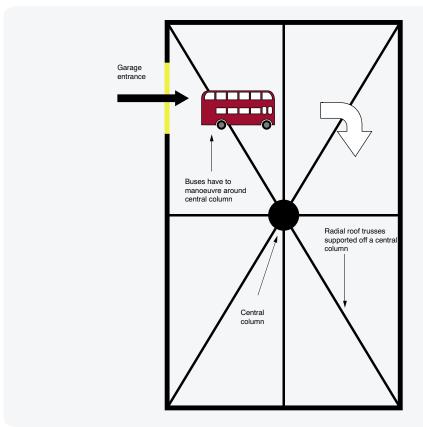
Example of a structure with a lack of redundancy (Source: IStructE (2010)).
